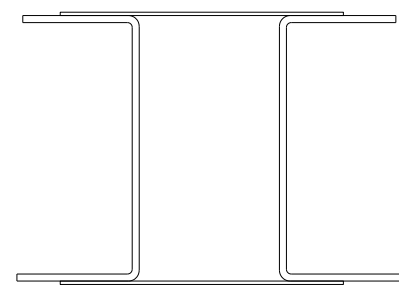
Cross-sectional details of the investigated aluminium alloy built-up channels with web holes
